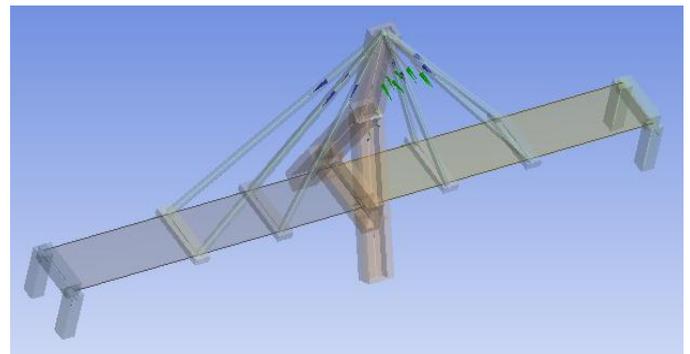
Straight cable stayed bridge with inverted Y shape pylon
